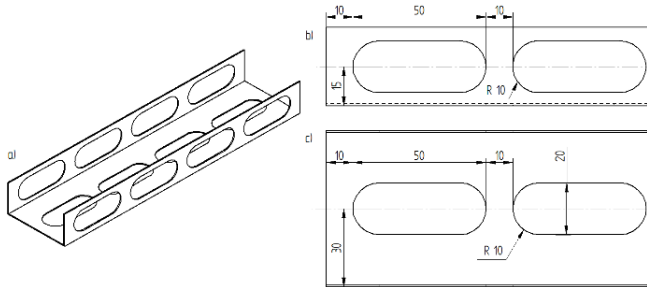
(a) Model C4 with bean-shaped holes with dimensions 50 mm × 20 mm (R = 10 mm) (b) geometric dimensions on the side wall part, (c) geometric dimensions on the web part
